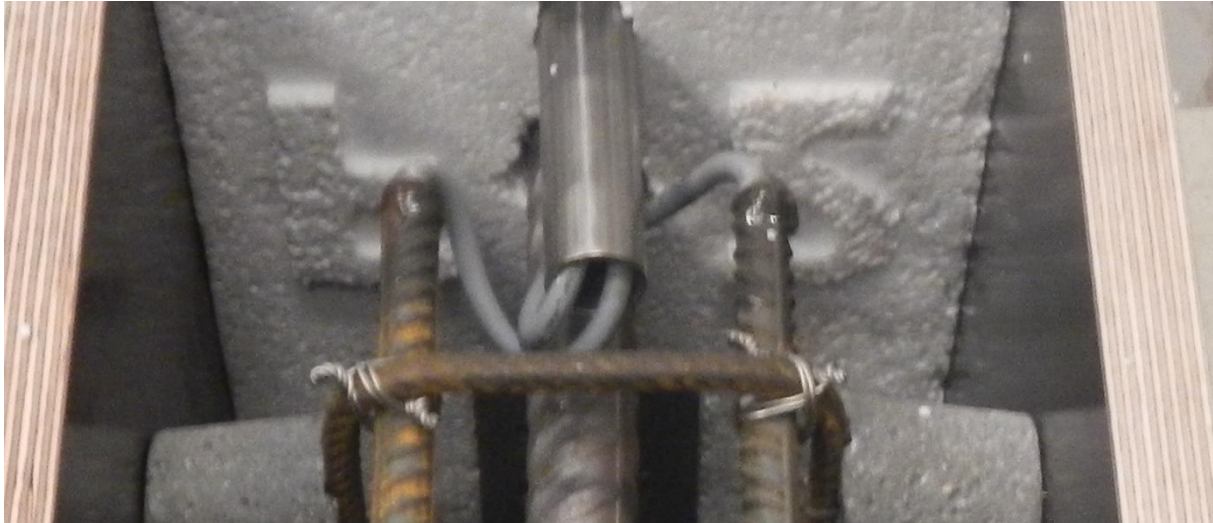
Fixation points between reinforcement cage and cables were sealed with epoxy.
